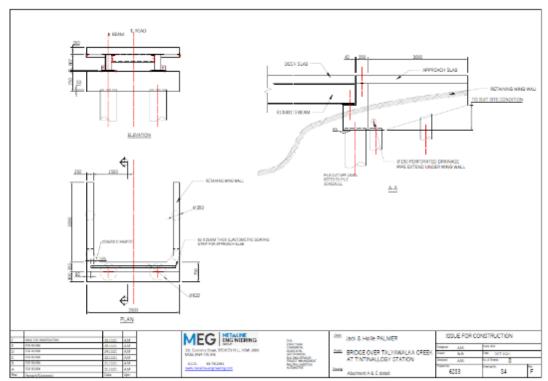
Architectural Drawings/ structural dwgs for installation of preconstructed bridge over Talywalka Creek at Lot3995 in DP 766468, Teryawynia Station,
